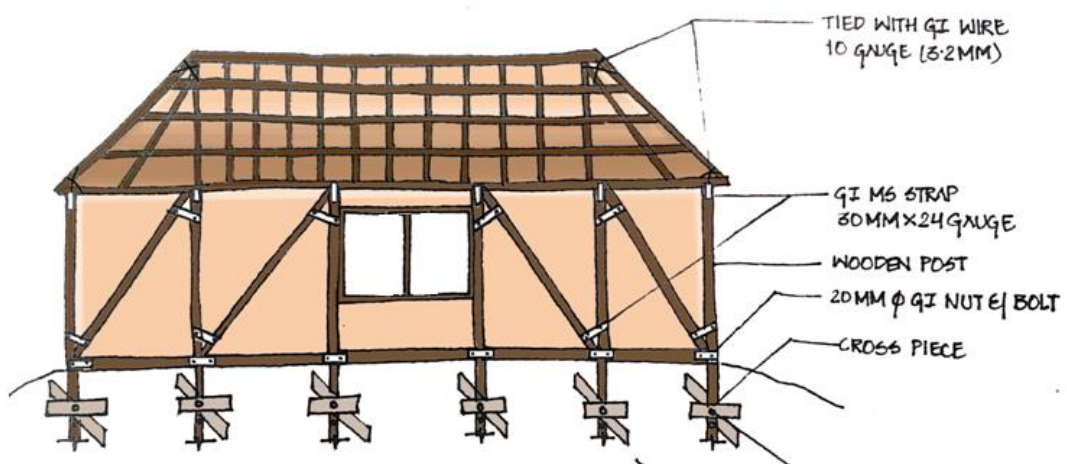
(B) IMPROVED CONSTRUCTION PRACTICE OF HOUSES WITH GABLE ROOF
